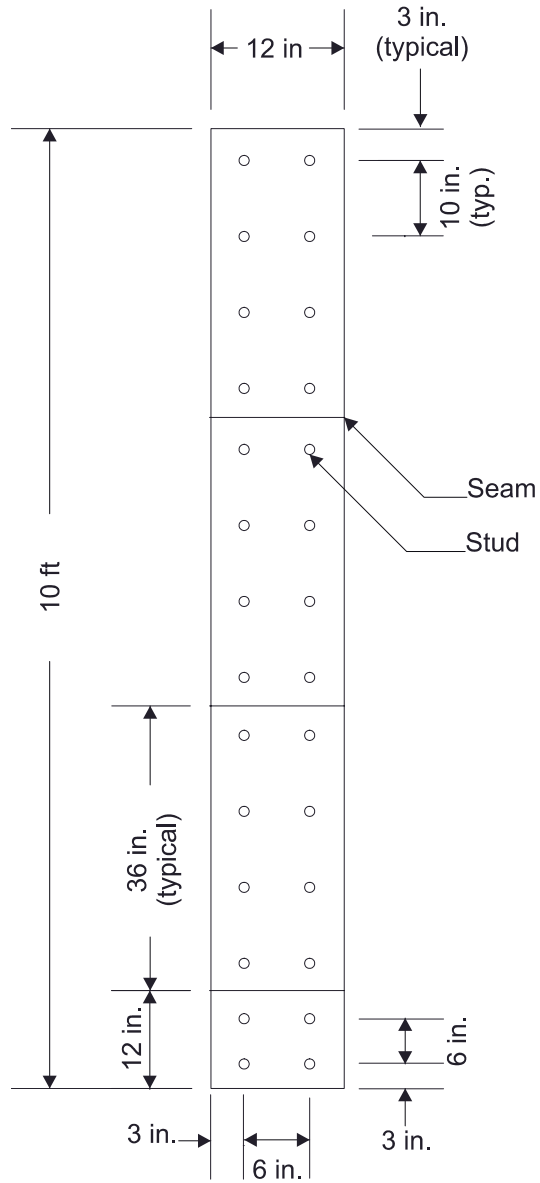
Installation layout - stud location and seams outside edges on stiffener face (typical frame bay panel - plan).
